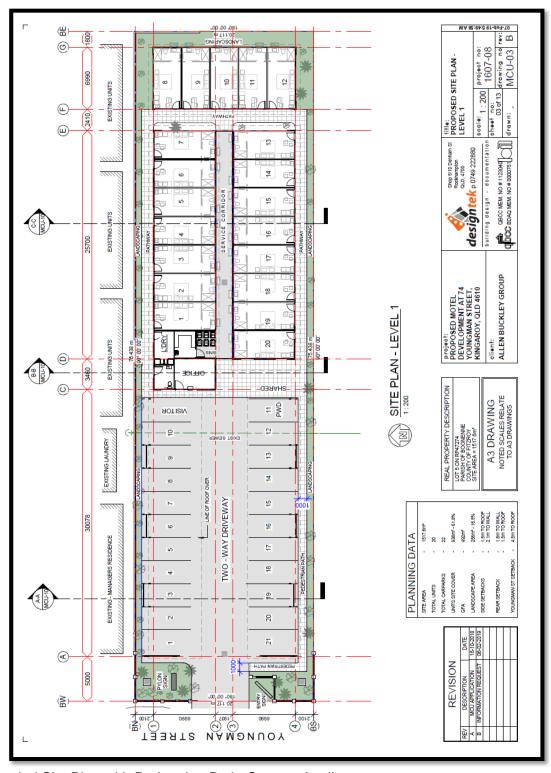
Amended Site Plan with Pedestrian Path, Source: Applicant
